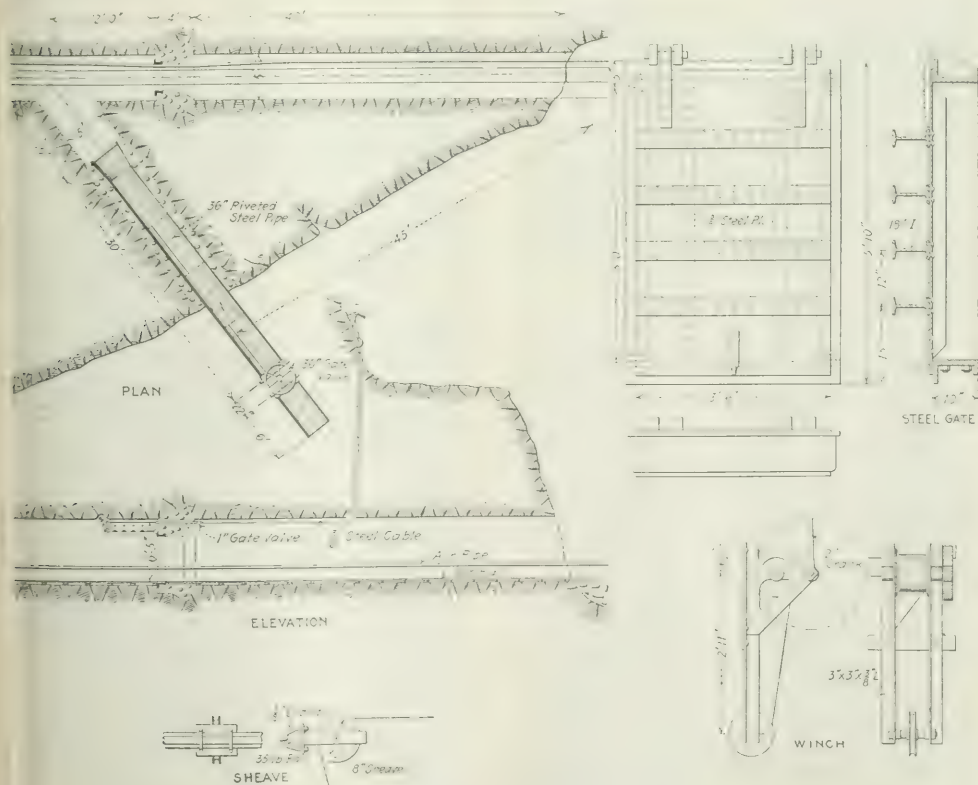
BULKHEAD AND TUNNEL OUTLET
